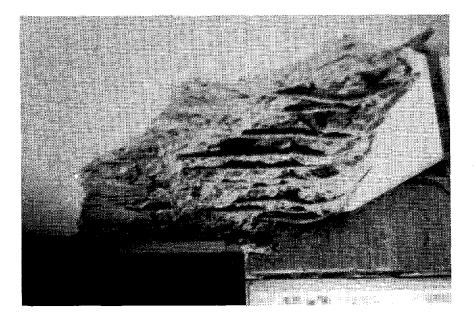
Stair landing damage, Residencias Union Building, 1967 Caracas Earthquake. (Photo courtesy of the Portland Cement Association.)
